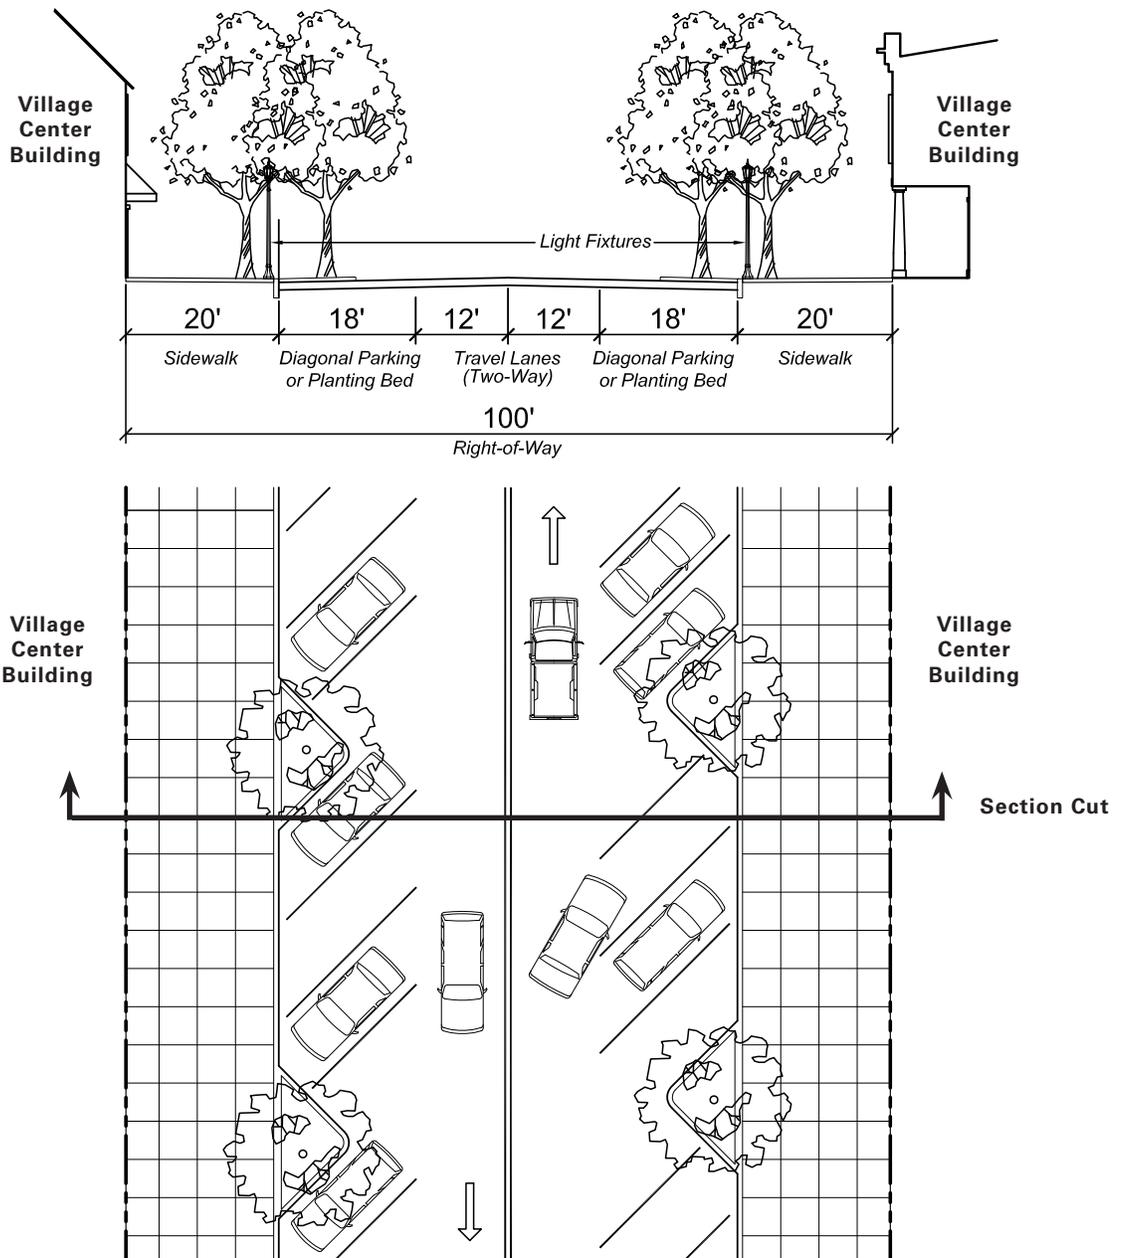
Proposed Section and Plan: Village Center Street A (Alternate)
